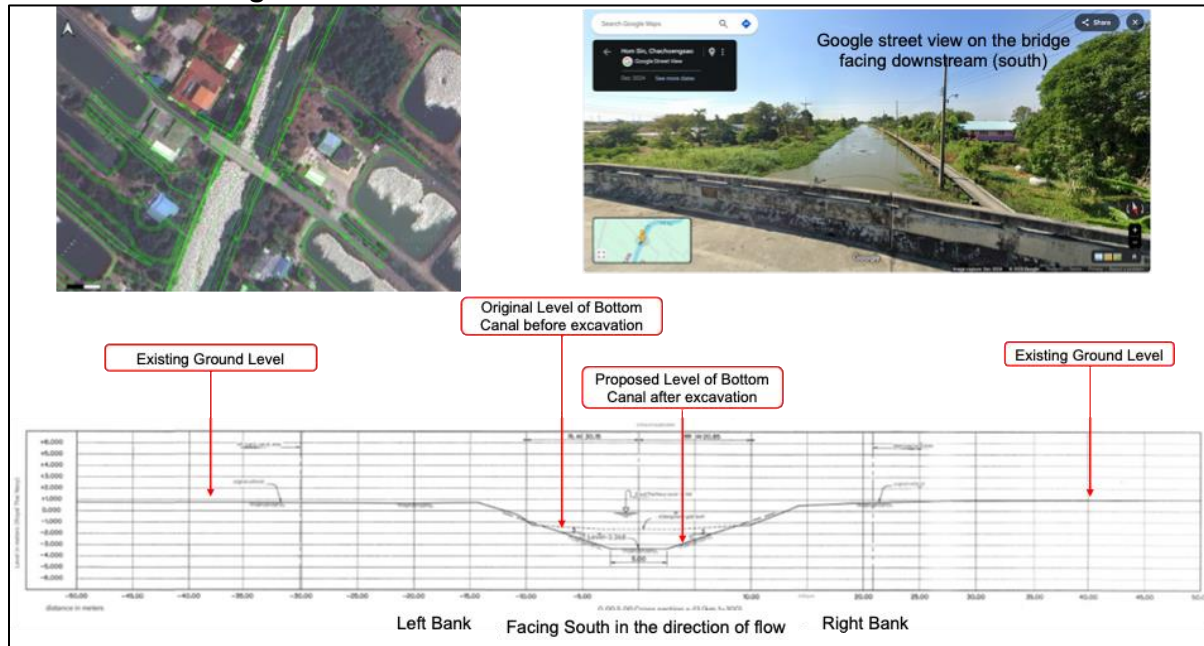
Cross-Section 3 in Pi Ka with no Sheet Pile Wall
